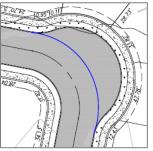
(2) Patterned poured concrete beyond the blue line within street bend bulb
